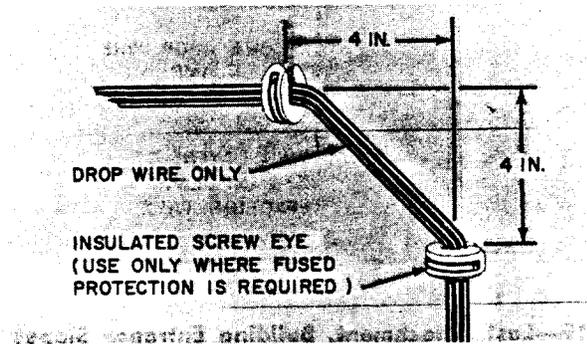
Spacing Insulated Screw Eye When Changing Direction of Wire Run
